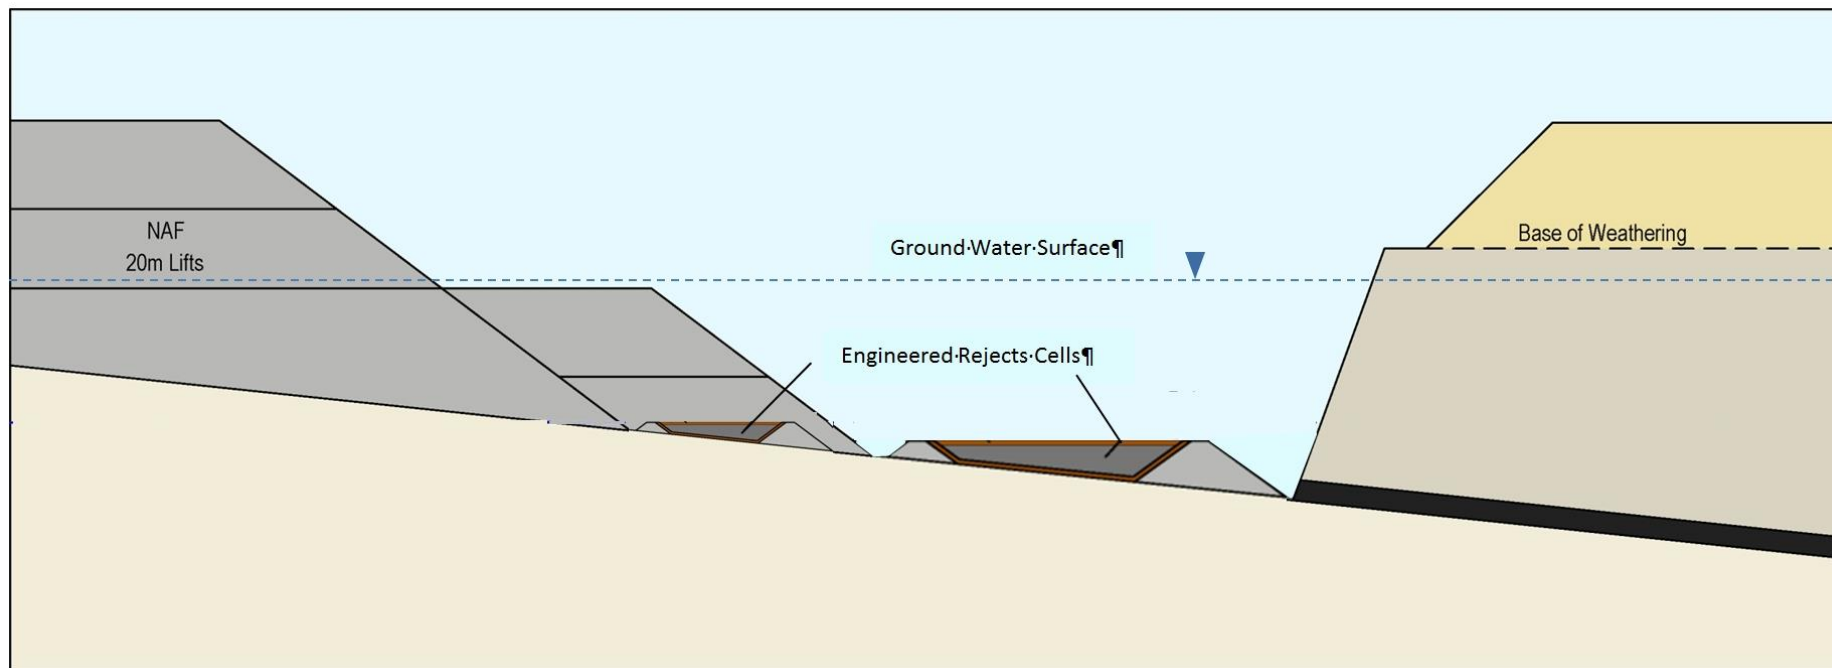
Typical Out-of-Pit Spoil Dump Design Cross Section
